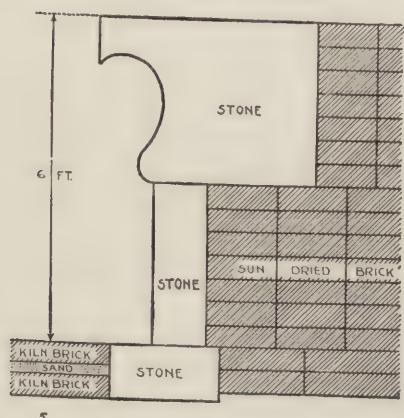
Typical Assyrian Temple Construction. Detail Showing Use of Sun-dried Bricks Faced with Limestone.
